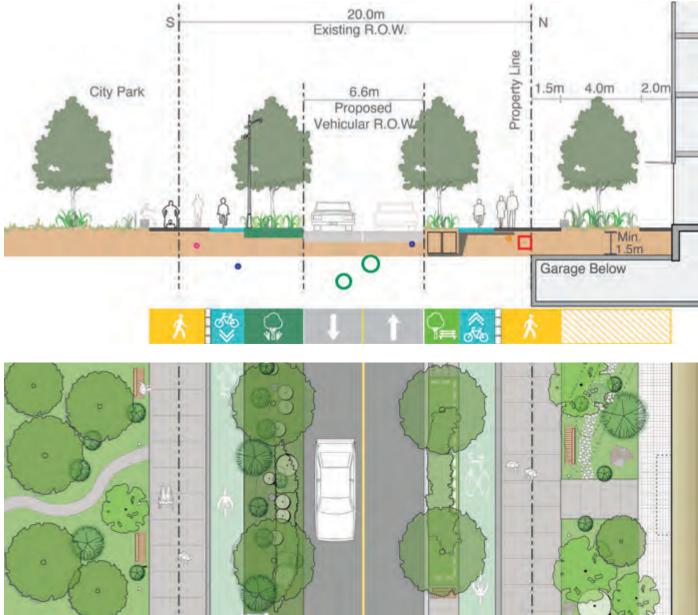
Section and Plan of Broadway Avenue - Recommended Final Condition of bump-out in front of parks
